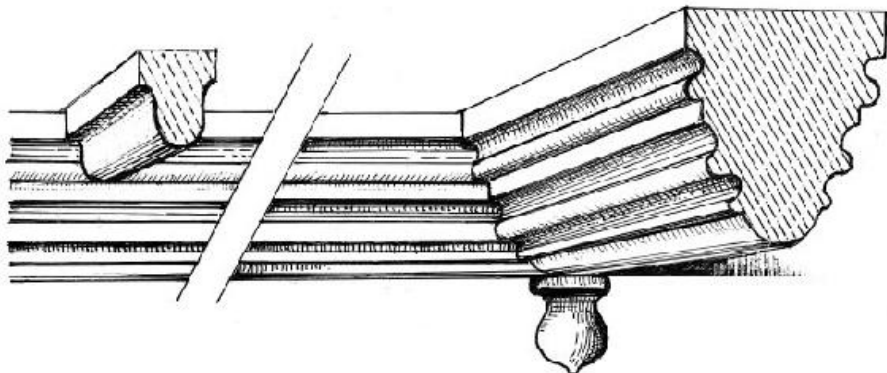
Detail of the ceiling beams in the lower room (the ceiled hall) of the former Conservative Club
